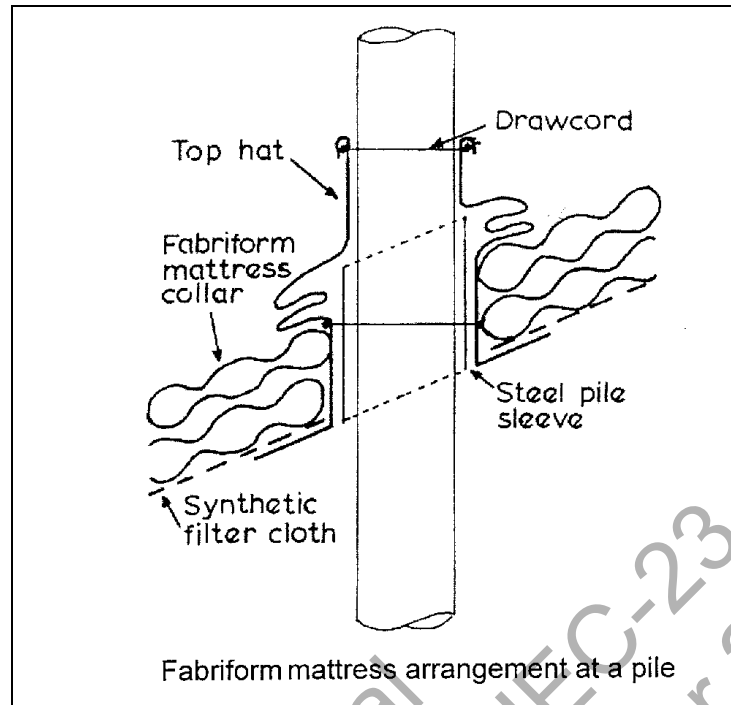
Flexible collar arrangement at a pile to seal the joint with a mattress.⁽¹²⁾
